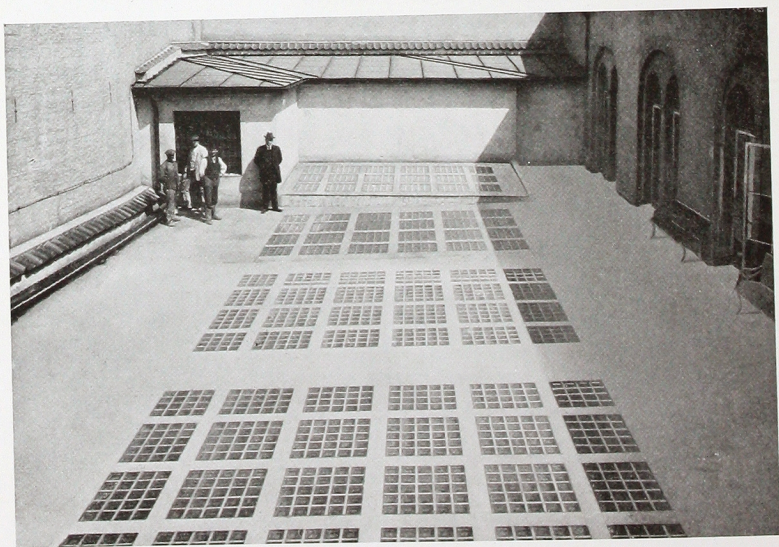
Top view of Figure 5. These panels, despite the concrete frame-work reinforcements, seem almost as one piece of glass when viewed from inside.
